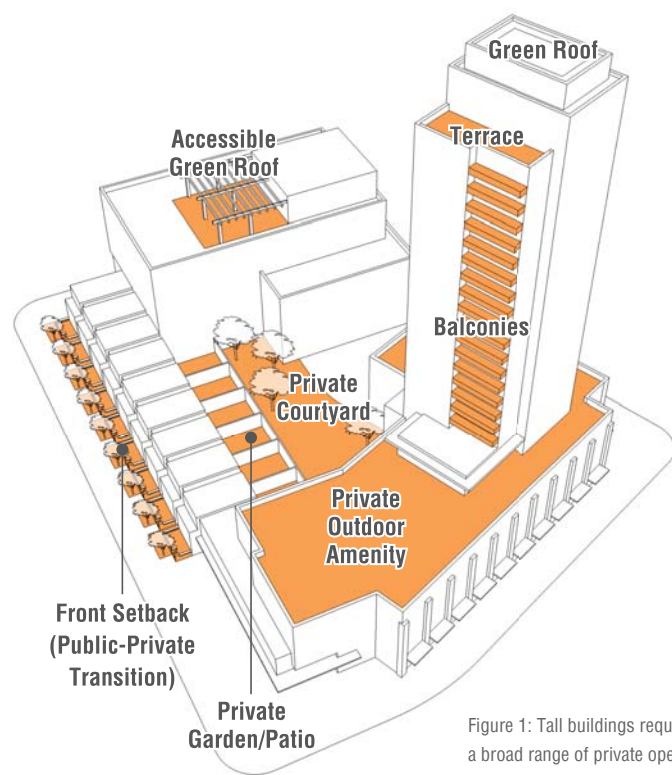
Tall buildings require a broad range of private open spaces to meet the needs of building occupants.
